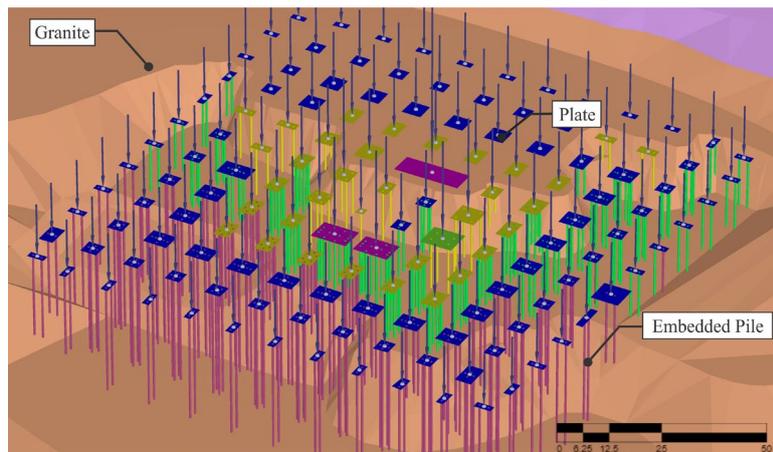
Plate (shallow foundation) and embedded pile (pile foundation) illustration in PLAXIS 3D.
